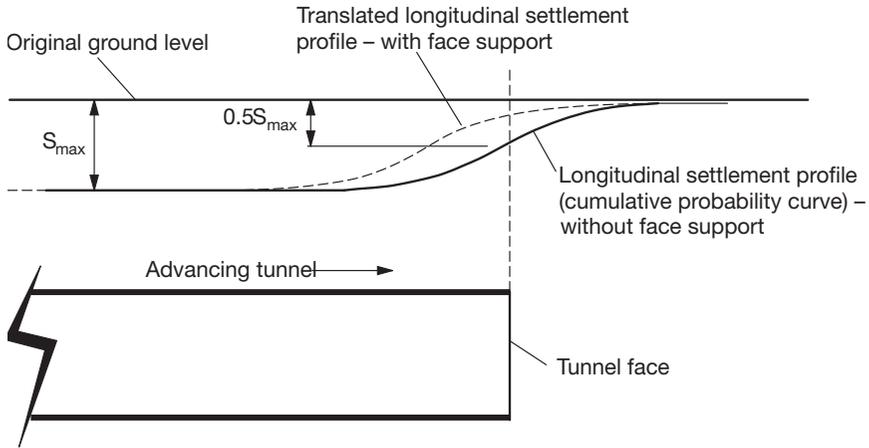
Longitudinal settlement profile above tunnels in soft ground, showing the difference in distribution for open face tunnelling and where there is significant face support (after Mair and Taylor 1997)
